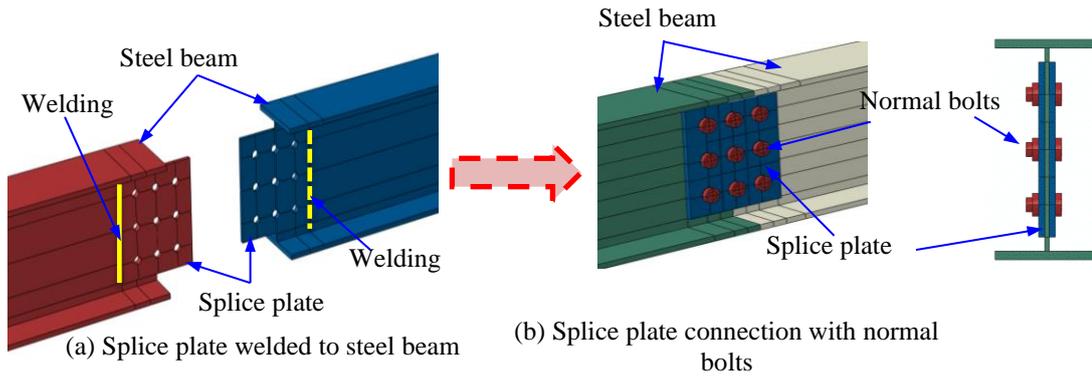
Details of proposed beam-to-beam connections with splice plates and normal bolts
